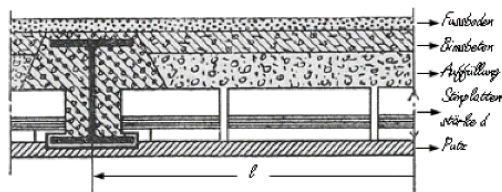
Historical slim-floor construction [Pe1922]
